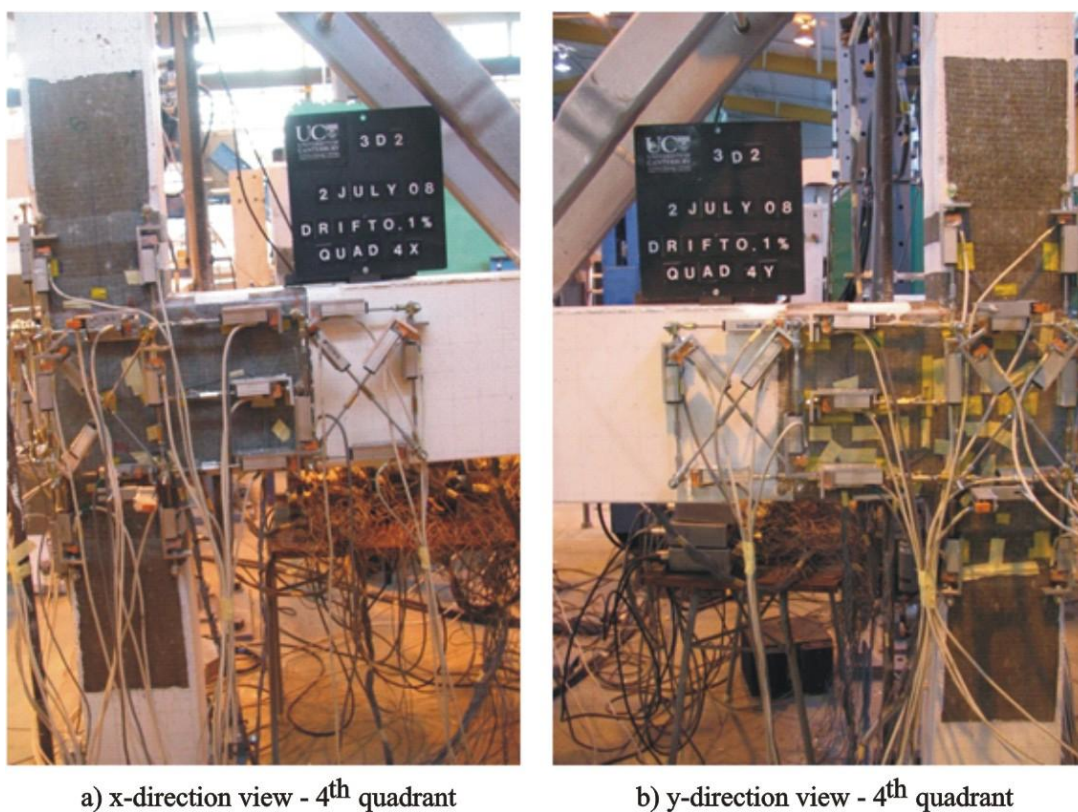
Damage propagation - Specimen 3D2, 0.1% drift
